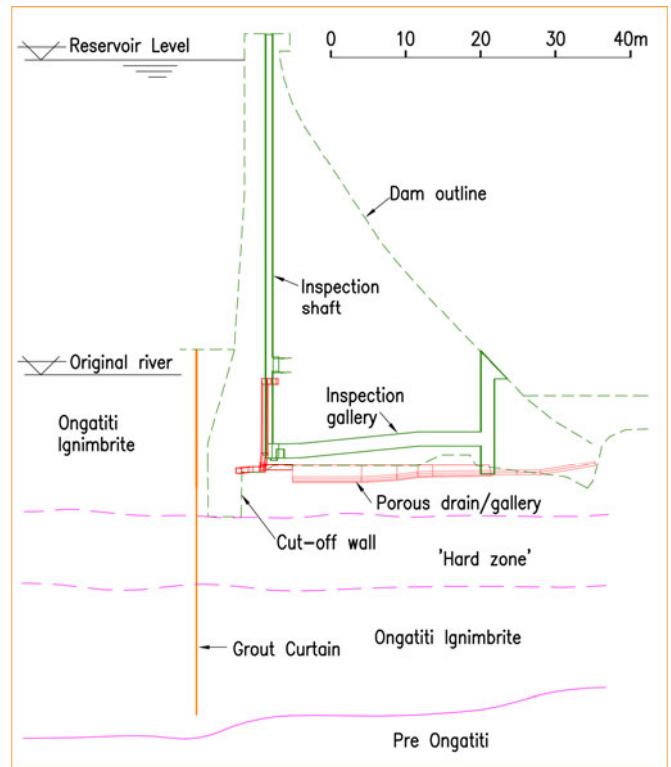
Cross Section of Arapuni Dam (Note the spatial separation of the grout curtain from the dam)
